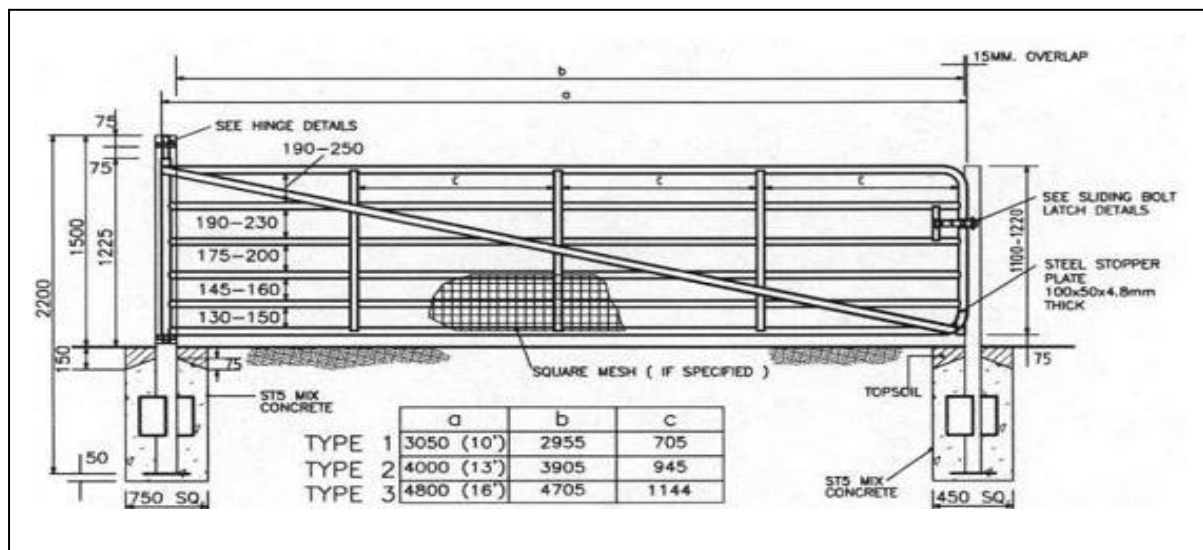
Typical Single Steel Gate Detail (CC-SCD-00309)
